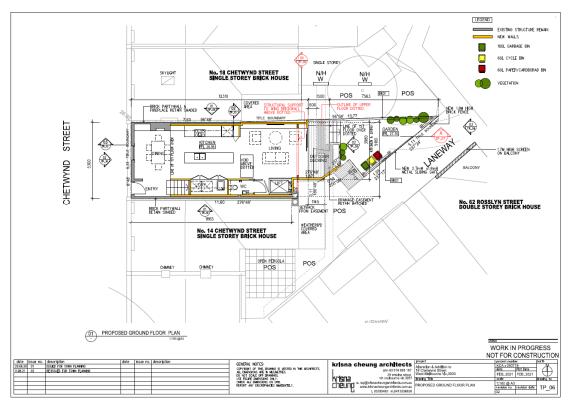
Ground Floor Plan (source: Krisna Cheung Architects Pty Ltd)
